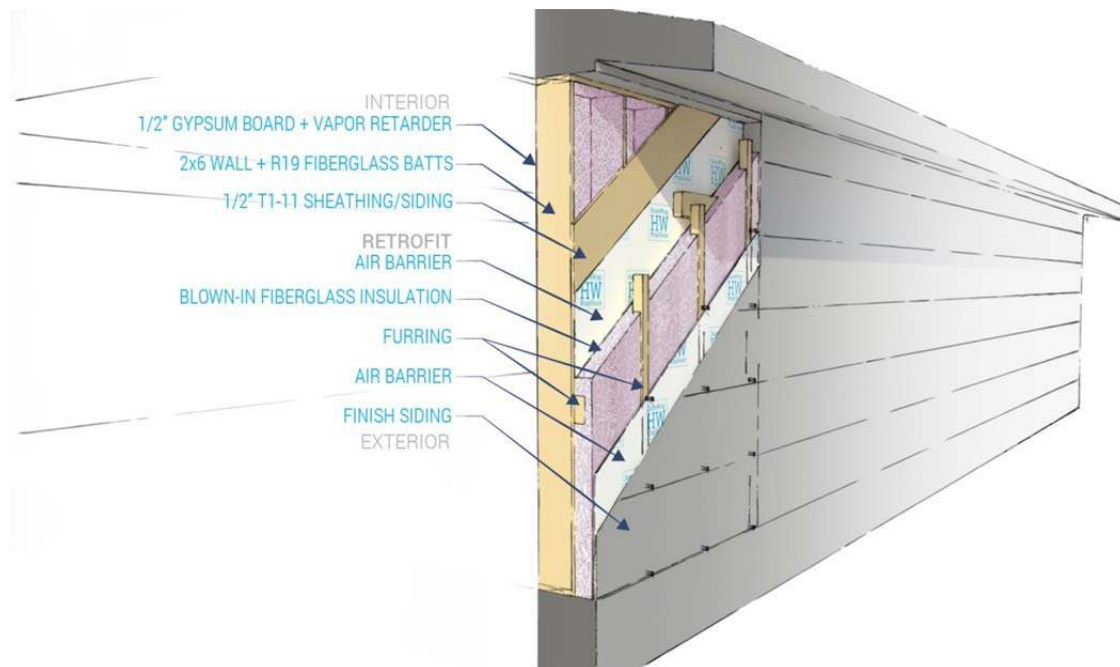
Fiberglass curtain wall. This wall has an exterior curtain frame to contain 3 inches of fiberglass.
